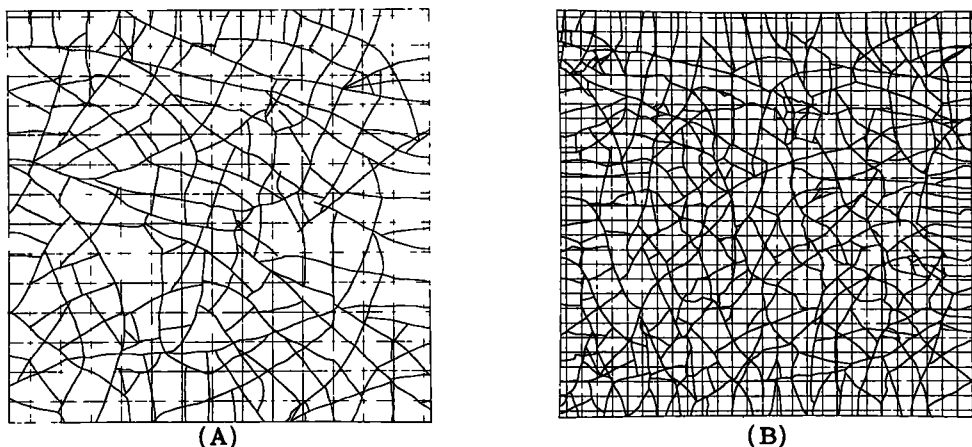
(A) Test slab No. 5, prestressing 360 psi by 360 psi, wire spacing 1.20 in. by 1.20 in., 75-lb load; (B) Test slab No. 10, prestressing 600 psi by 600 psi, wire spacing 0.60 in. by 0.60 in., 90-lb load. Crack patterns developed in the bottom side of two test slabs. Slabs loaded using an 0.75-in. radius footprint applied at 1-in. intervals over the entire area of the slab.
